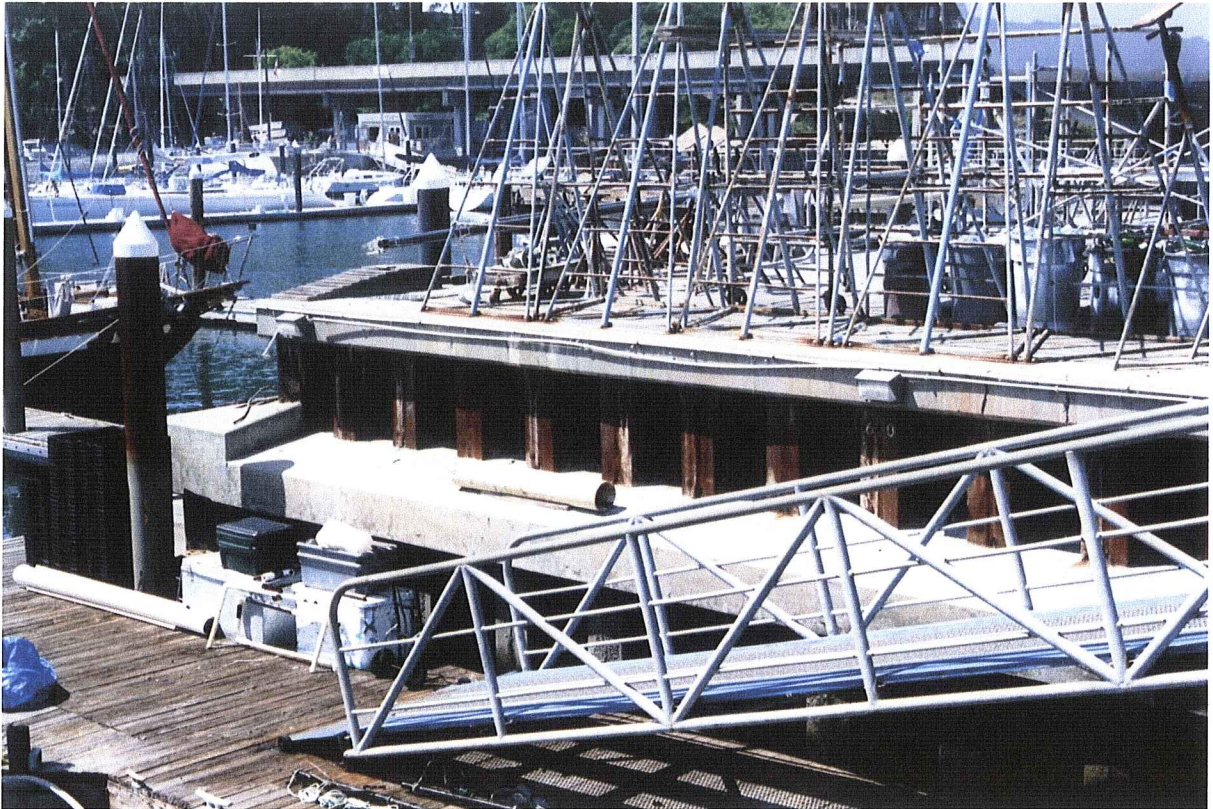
View of the present boat repair dock with completed construction on the sheet pile bulkhead.
